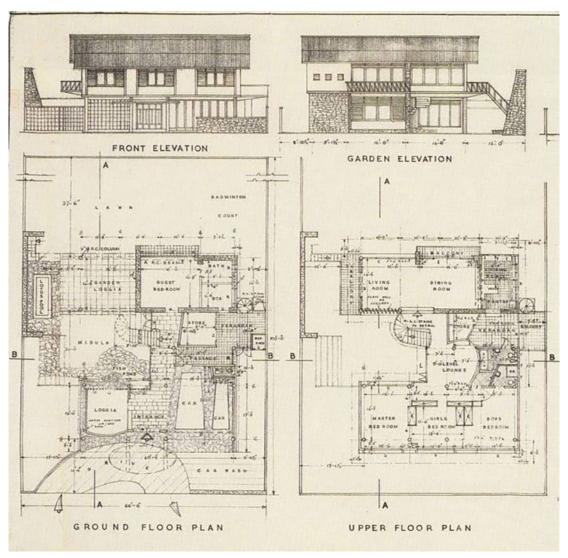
Pieris House drawings (Minnette de Silva, 1952)
